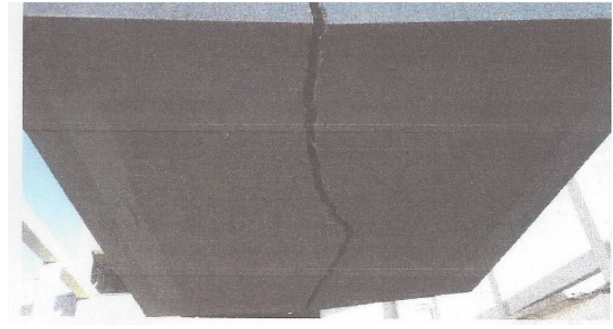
Failure pattern of fiber concrete slab without ties (P-1)
